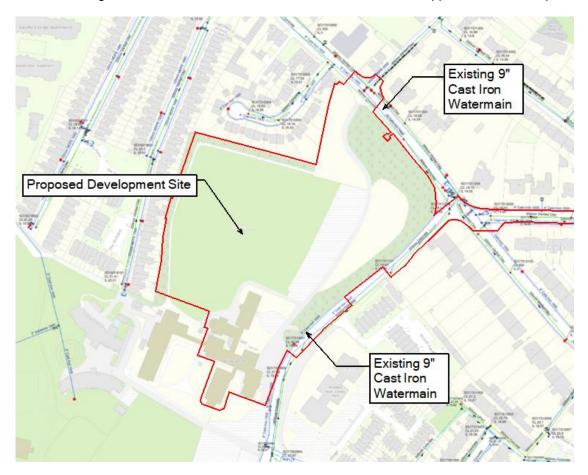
Extract from Irish Water's Network Plan (Site Boundary Indicative Only)
